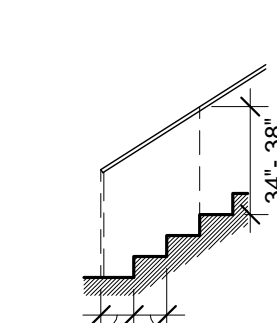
TOP HANDRAIL EXTENSION AT STAIRS
